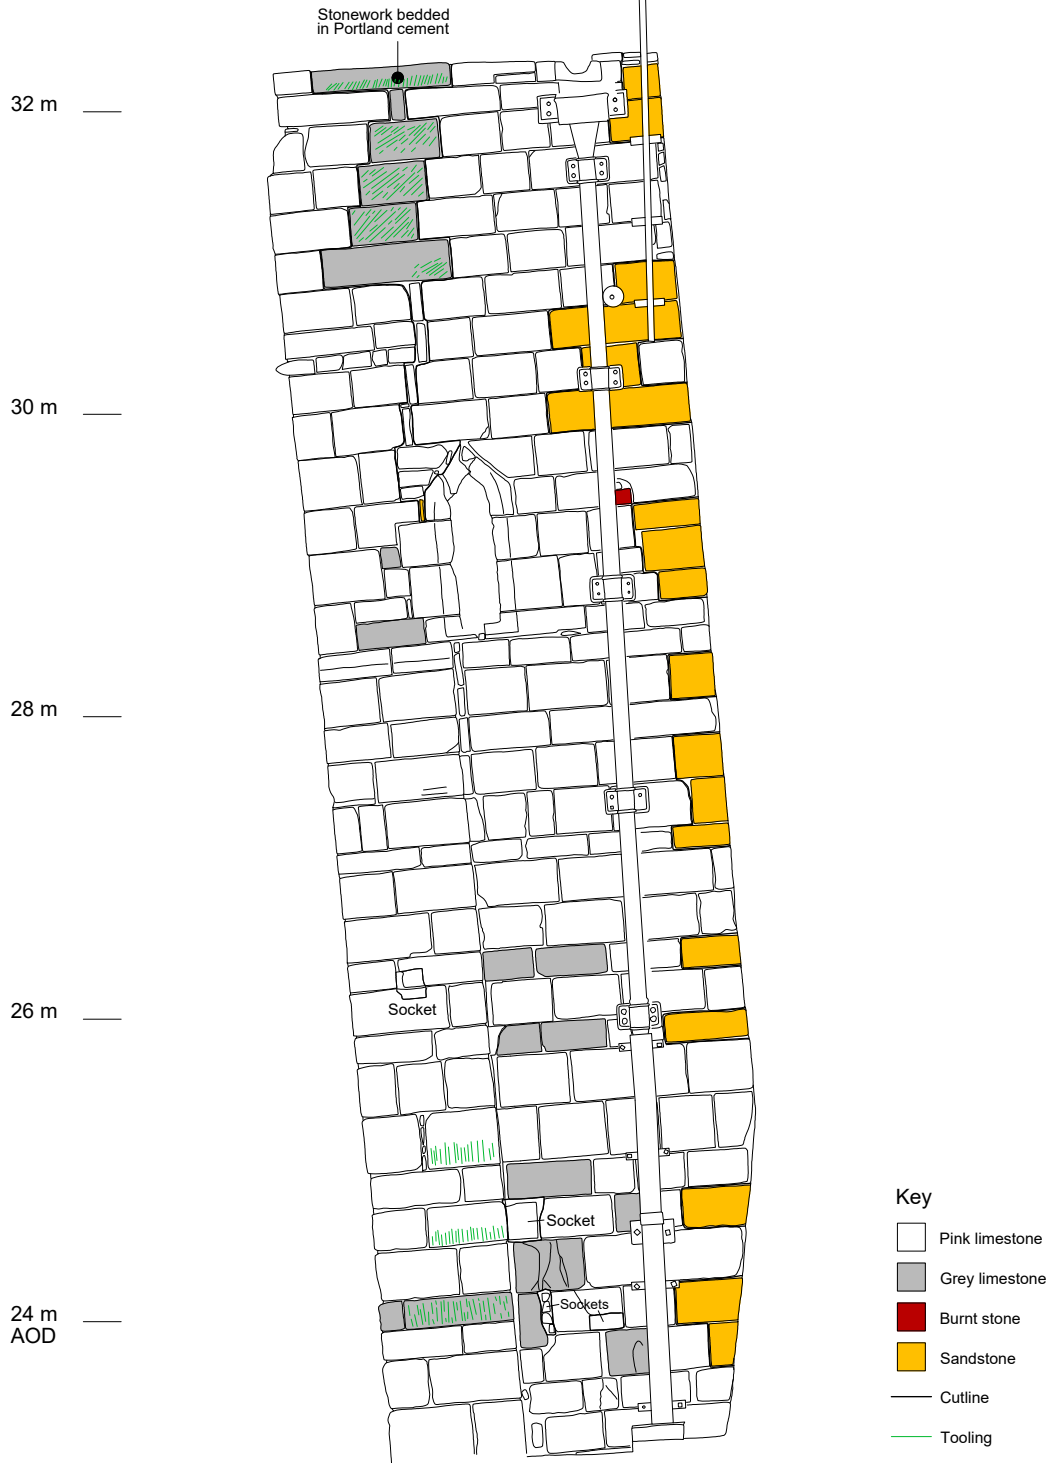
External northeast elevation of the forebuilding Scale 1:50@A4
